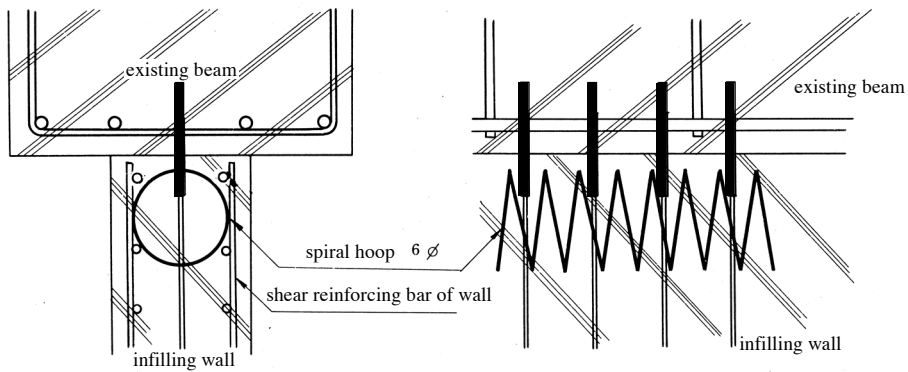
Strengthening against splitting with spiral reinforcing bars
